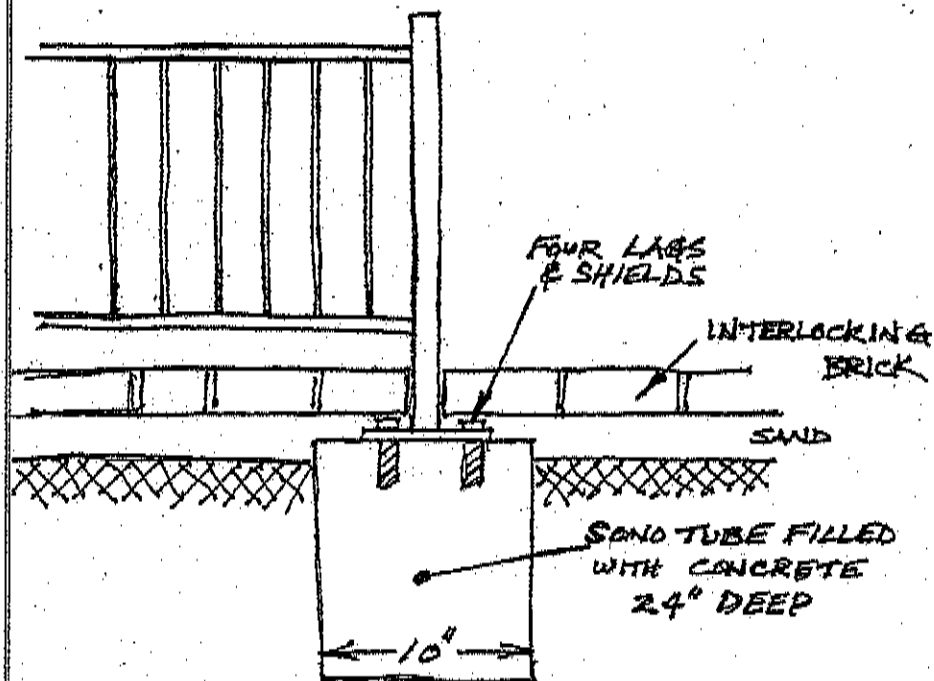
ii) - Anchoring fencing into areas of interlocking brick.
